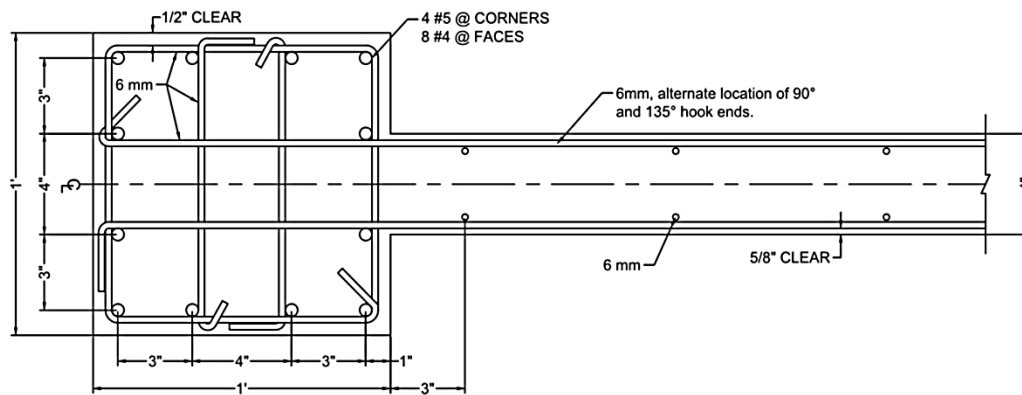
Shear Wall Specimen B10 – Cross Section (Oesterle et al. 1979)
